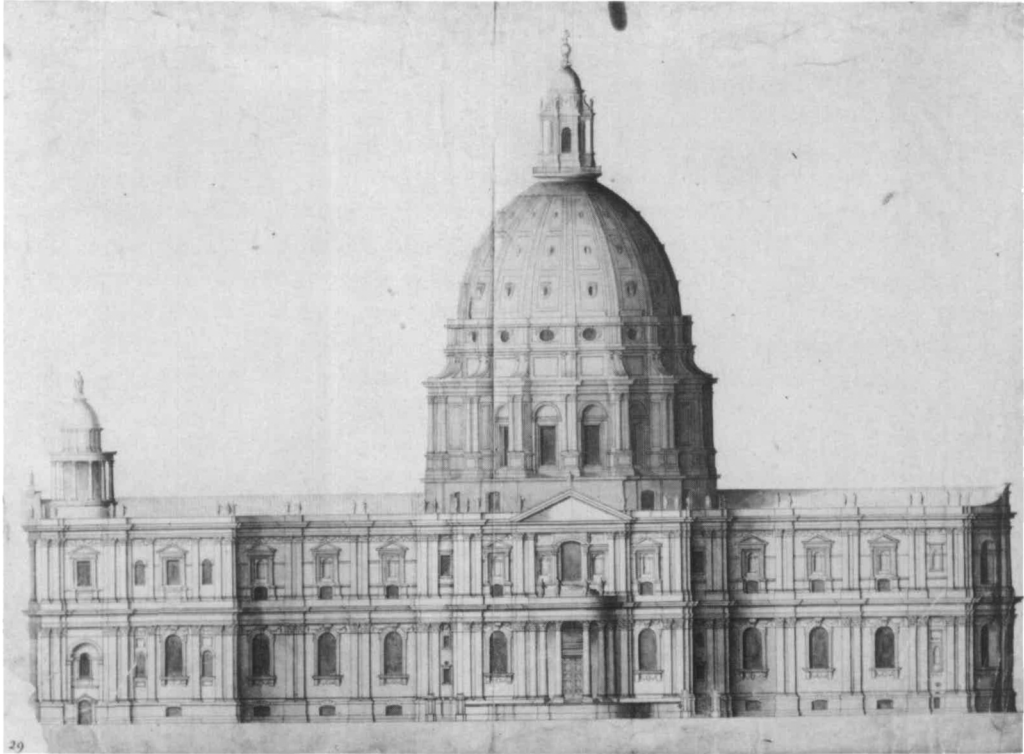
Wren. South elevation drawing for St Paul's (*All Souls II.29*)
